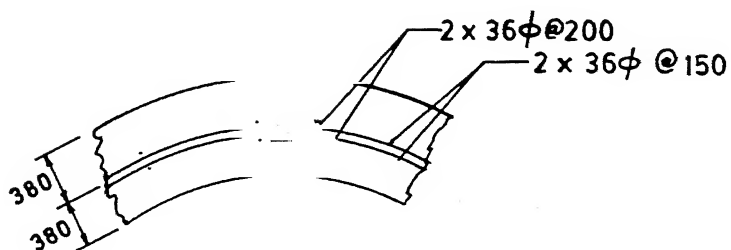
REINFORCEMENT DETAILS OF THE HEMISPHERICAL DOME
